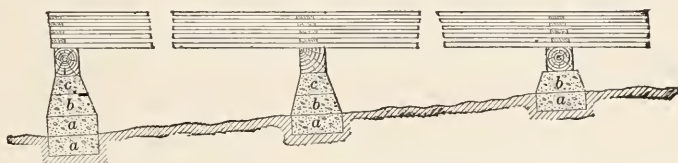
Built-up Concrete Foundations for Lumber Piles. The Blocks *a* are 16 by 16 Inches square and either 4 or 6 Inches in Height. Blocks *b* have a 16-by-16-inch Base 6 Inches high and a 12-by-12-inch Top. Blocks *c* have a Base 12 by 12 inches, a Top 8 by 8 inches, and a Height of 6 Inches. Timbers 6 by 6 or 6 by 8 Inches in Cross-section are placed on the Blocks and serve as Caps on which the Lumber is piled.
